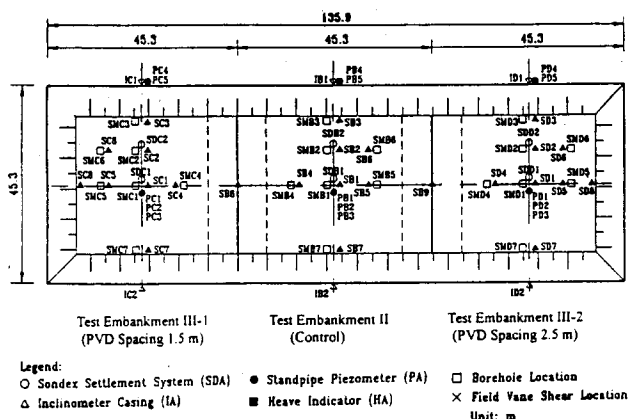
Layout of Instrumentation at Test Embankments II, III-1 and III-2.
